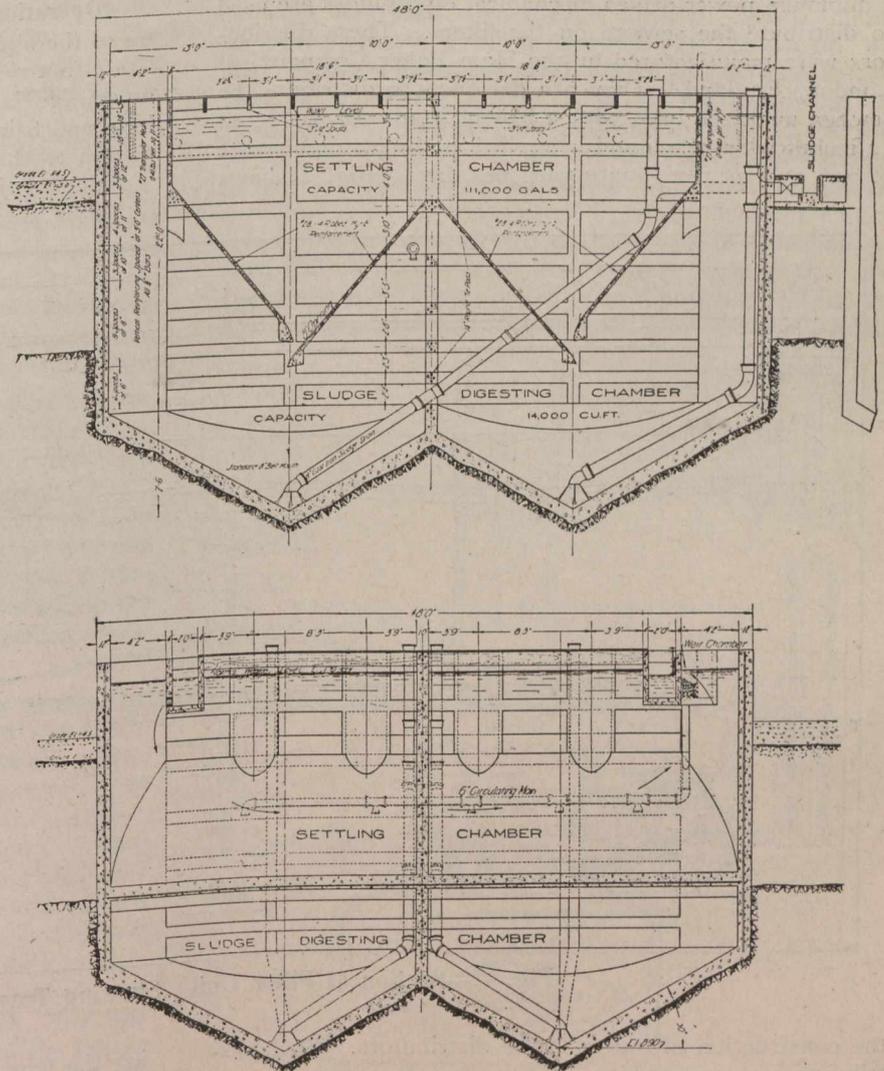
Detail Sections of Main Settling Tank.—Upper Section on CC., Lower Section on BB.
